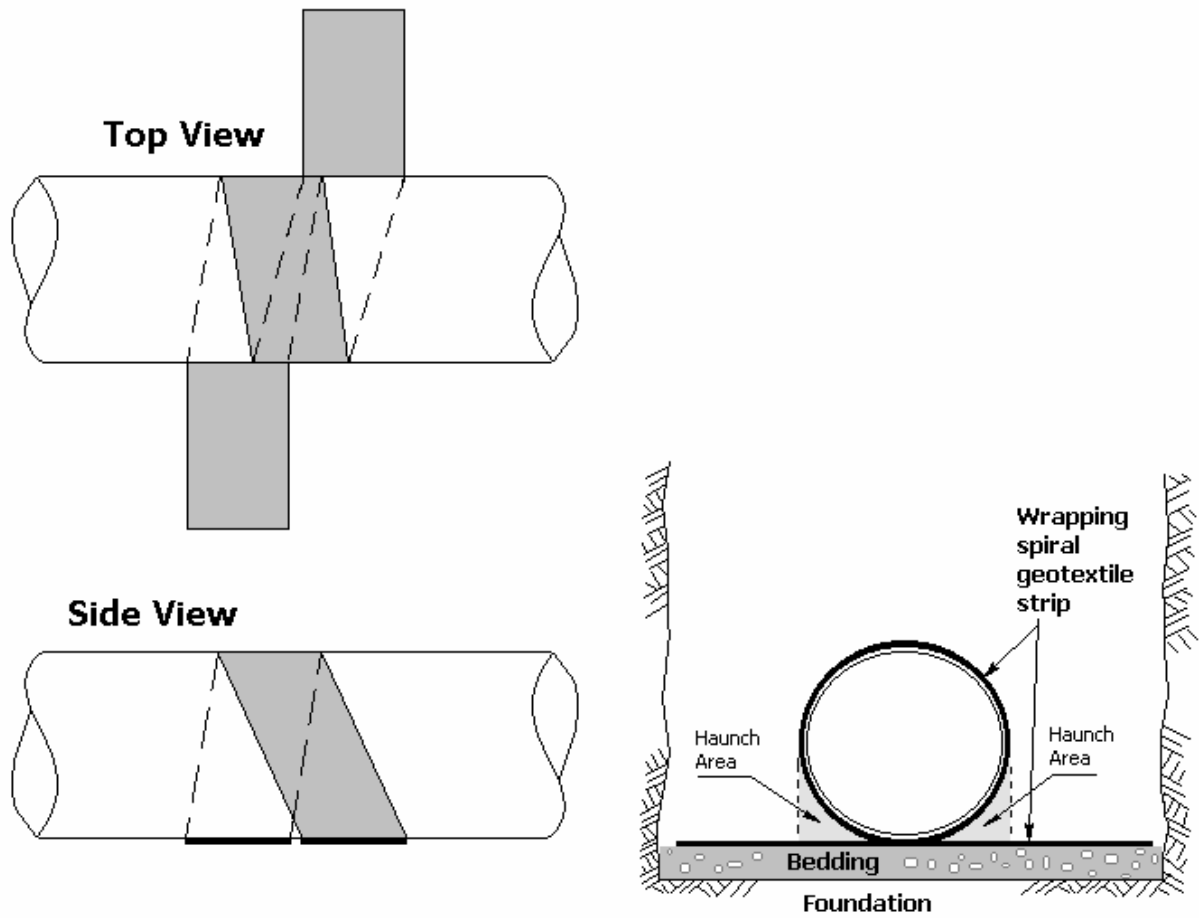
Spiral geotextile strip tying down the pipe to facilitate compaction of backfill
